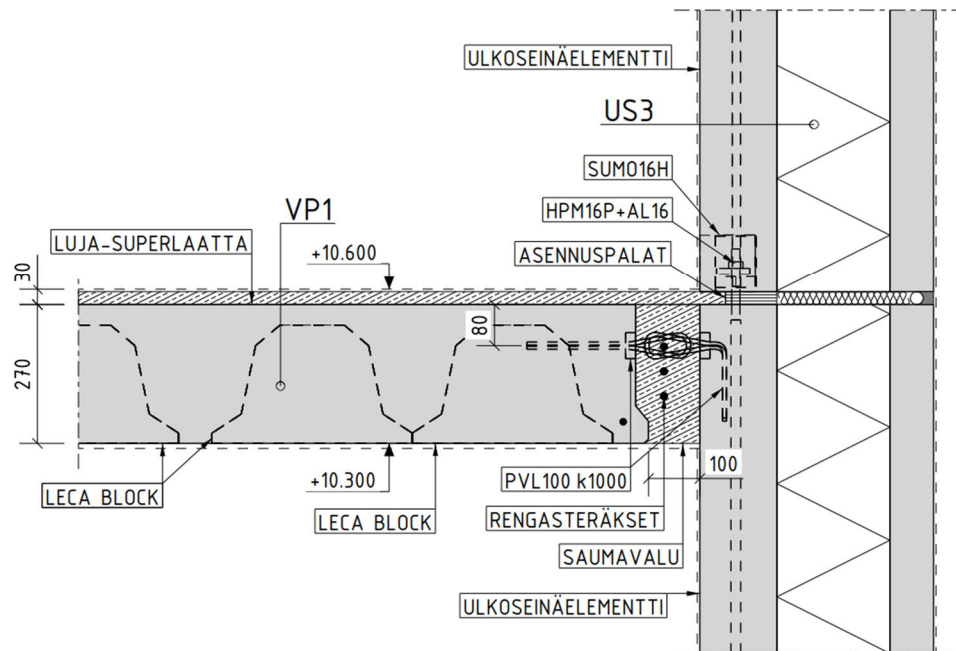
Connection to wall with PVL connecting loops (Tekla Structures drawing snapshot)
